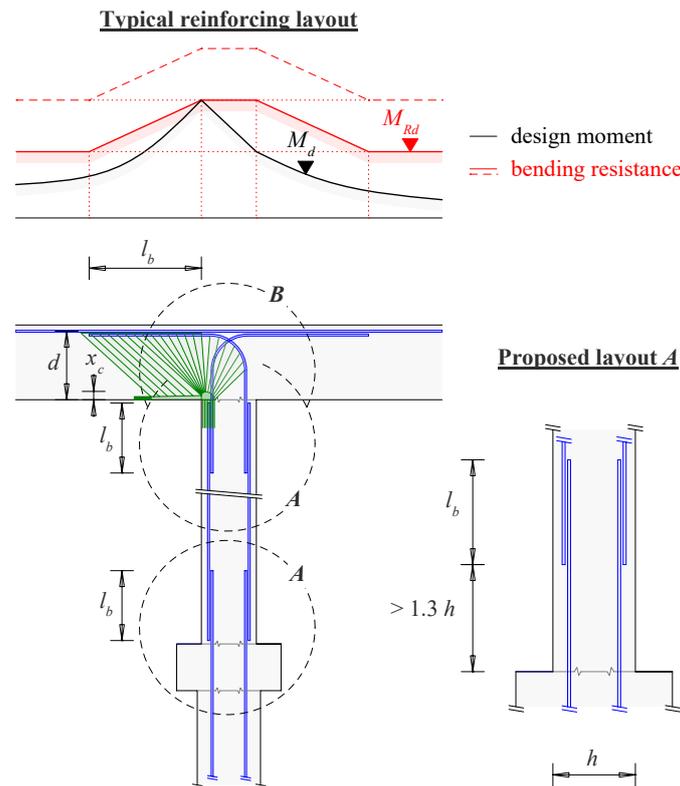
Design recommendations for lap splices: Detail A: Conventional and proposed reinforcement layout in highly loaded regions potentially undergoing plastic deformations. Detail B: Typical reinforcement layout above bridge piers which are monolithically connected to the bridge deck, along with the stress field and the moment distribution in this region. Shown are the moment resistance from conventional design, where the continuous reinforcement covers the design load alone (dashed line), and the moment resistance with the proposed reduction of the continuous reinforcement.
